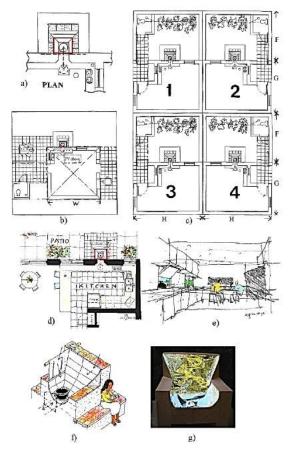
Thru-Reflector-Wall (TRW) solar kitchen house cluster planning: a) partial low cost kitchen plan; b) house-site plan; c) four house plan cluster; d) kitchen plan with terrace; e) TRW kitchen interior sketch; f-g) exterior view and sketch model of augmented nonimaging reflector funnel concentrator.
